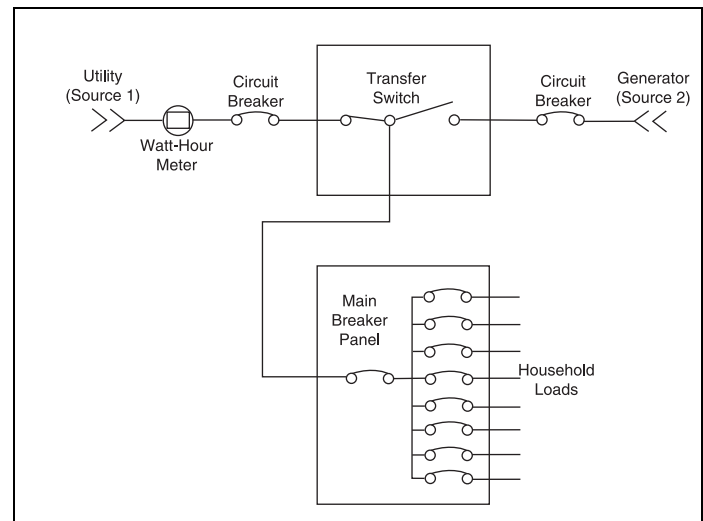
Typical Installation of a Residential or Light Commercial ATS.
